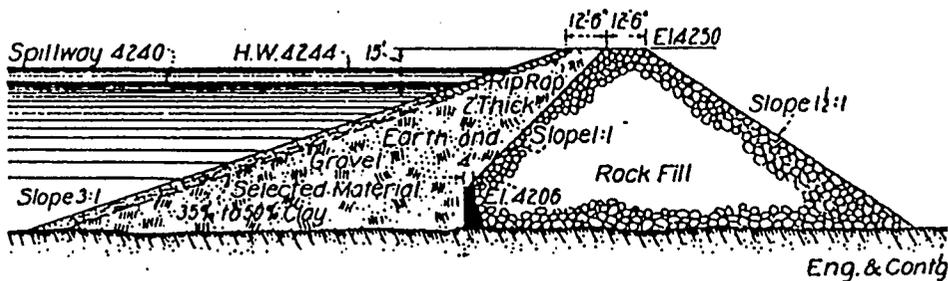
Section through Minidoka Dam, from Engineering and Contracting, 9 April 1913.
